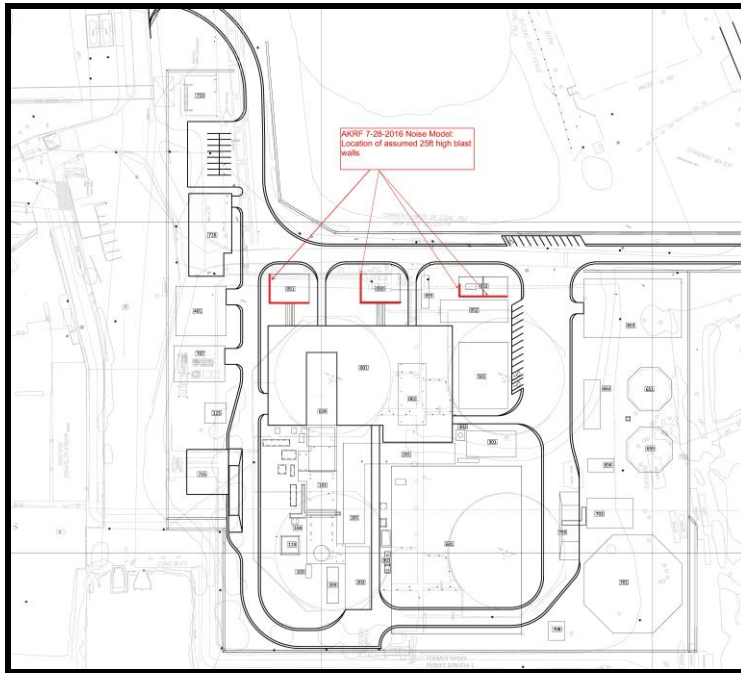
Outdoor Transformer (CTG-GSU, STG-GSU and Unit Aux) Sound Barrier Walls
